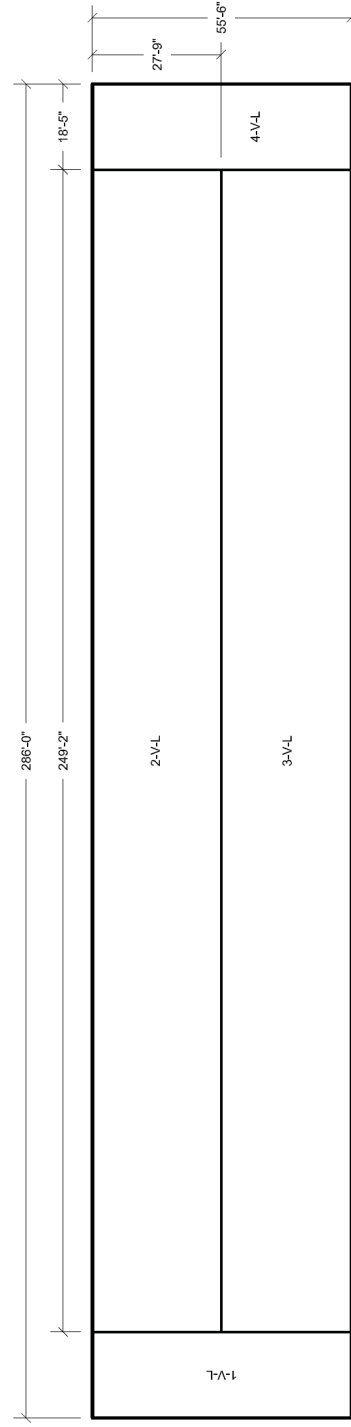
H.6-108: COOLING TOWER NORTH (AND SOUTH) WALL LOOKING SOUTH (NORTH)
